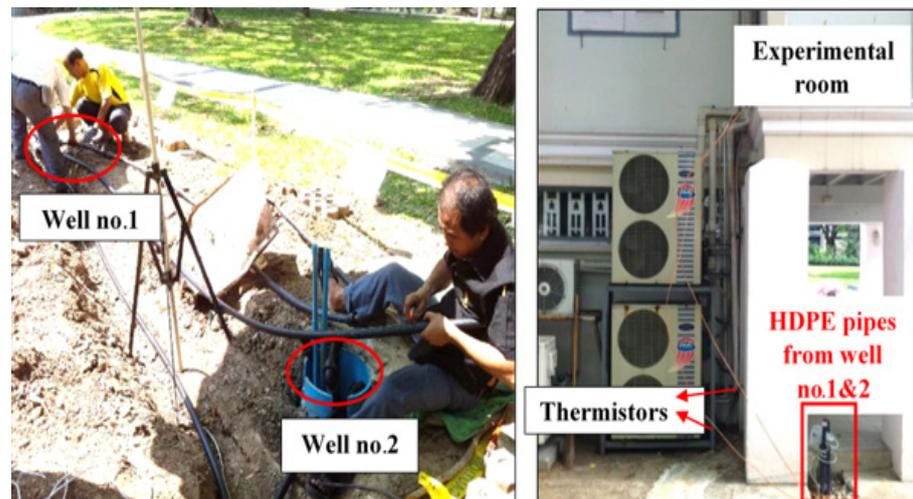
Installation of the GSHP connected to the second floor of the Parot Racha building, Bangkok, Thailand (obtained from the report by Chokchai et al. [27]).
